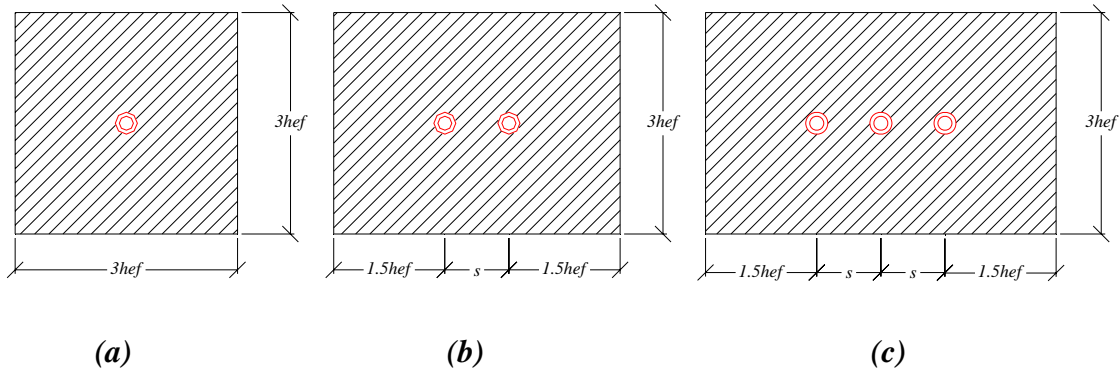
Assumed projected concrete failure area of studs for specimens with no haunch and (a) one stud, (b) two studs, and (c) three studs
